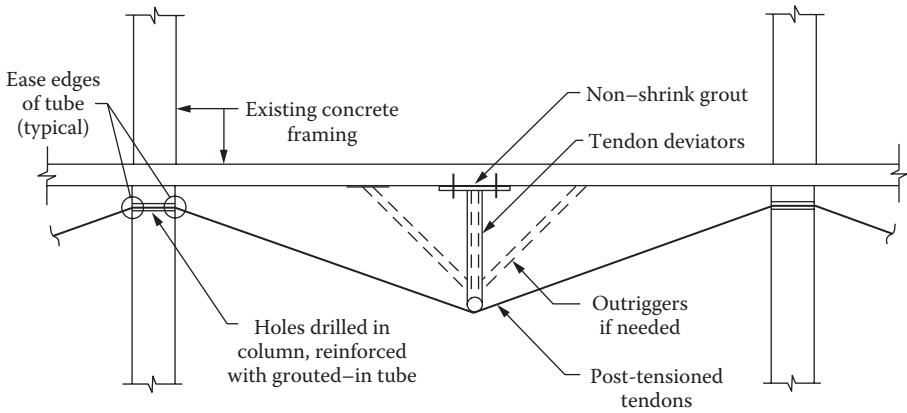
Strengthening concrete slabs by post-tensioning.
